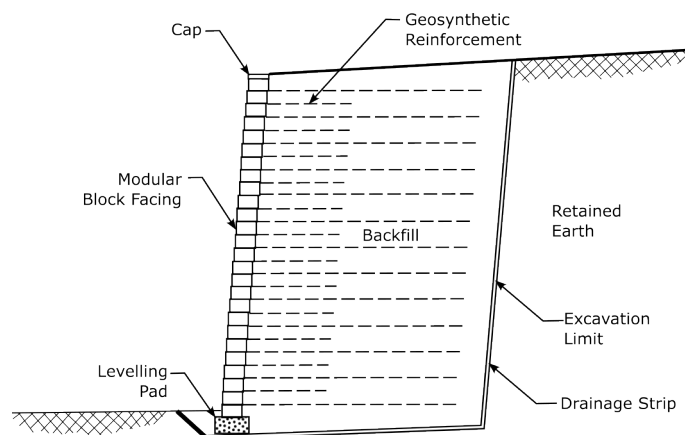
Typical Geogrid Reinforced Soil (GRS) wall with modular block facing
